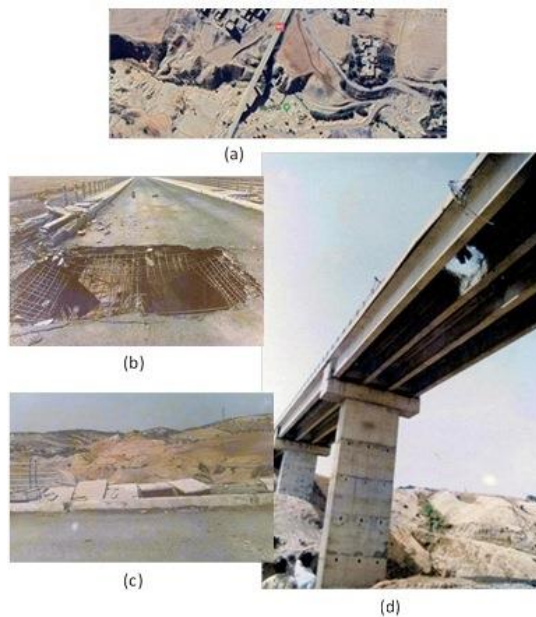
Bridge over Oued Gouasmia RN 17, Source: Authors, (a) Satellite image (b) Extent of disorders on the deck (c) Extent of disorders on the sidewalk and guardrail (d) Damaged span (girder and slab).
